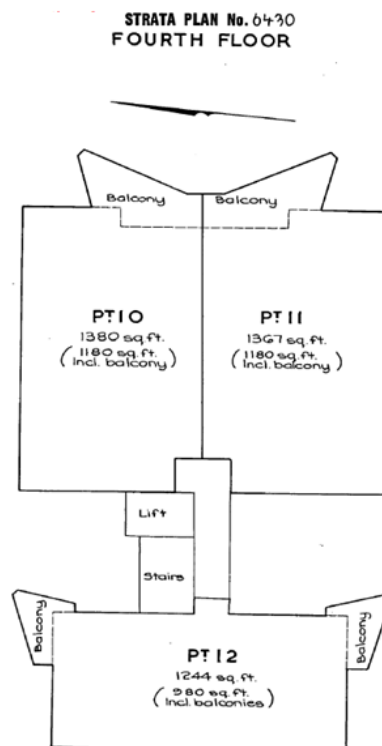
Strata Plan for Level 4 of 33 Malvern Avenue. Note that photos were taken from Pt 10 Balcony.
